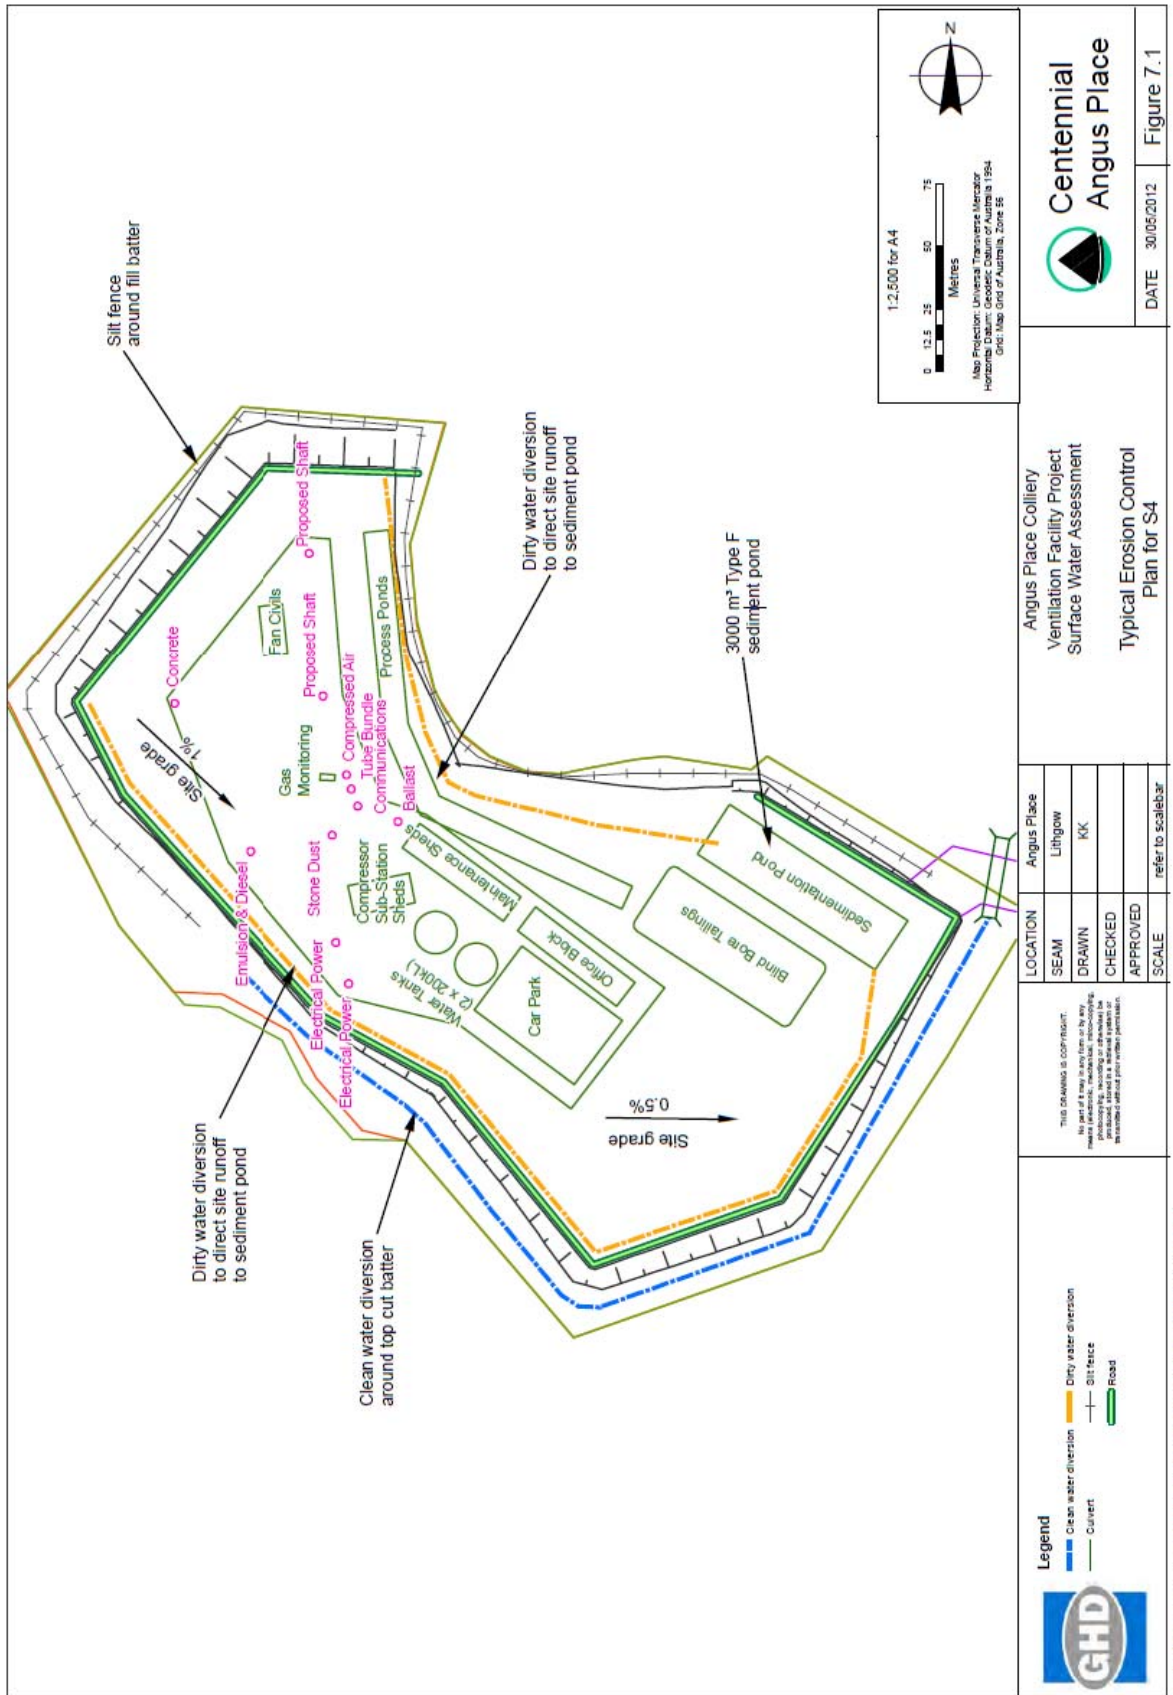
Ventilation Facility Site Erosion Control Plan for Ventilation Facility Site
